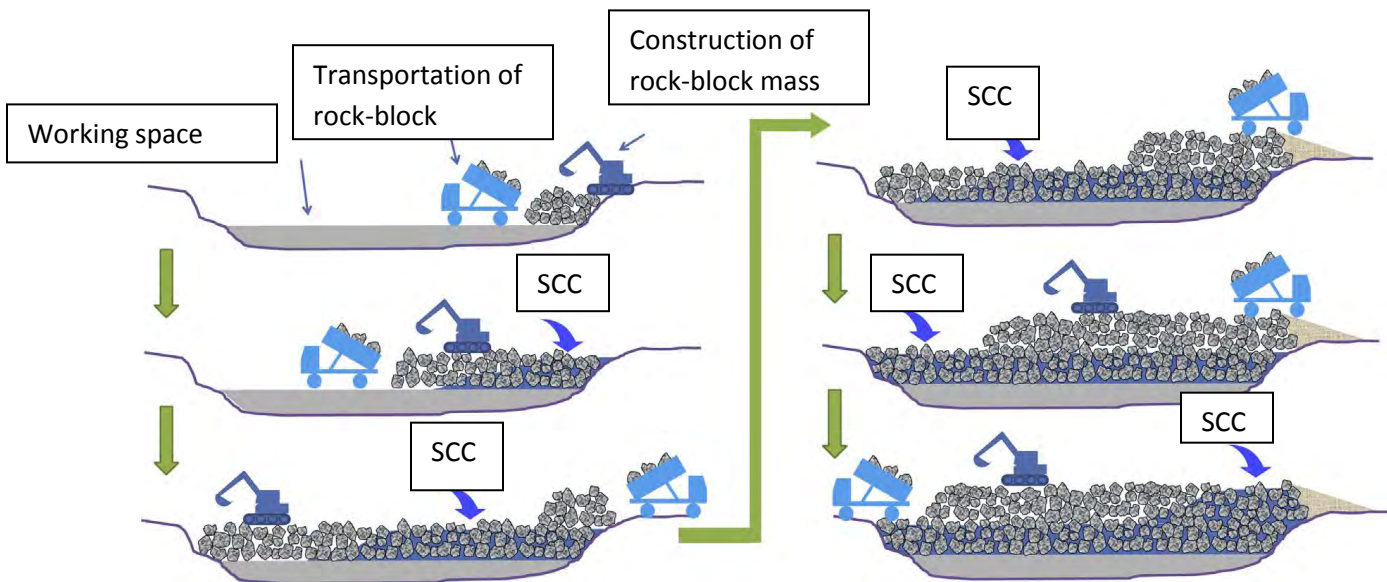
Cyclic constructions with general-type RFC construction technology.
